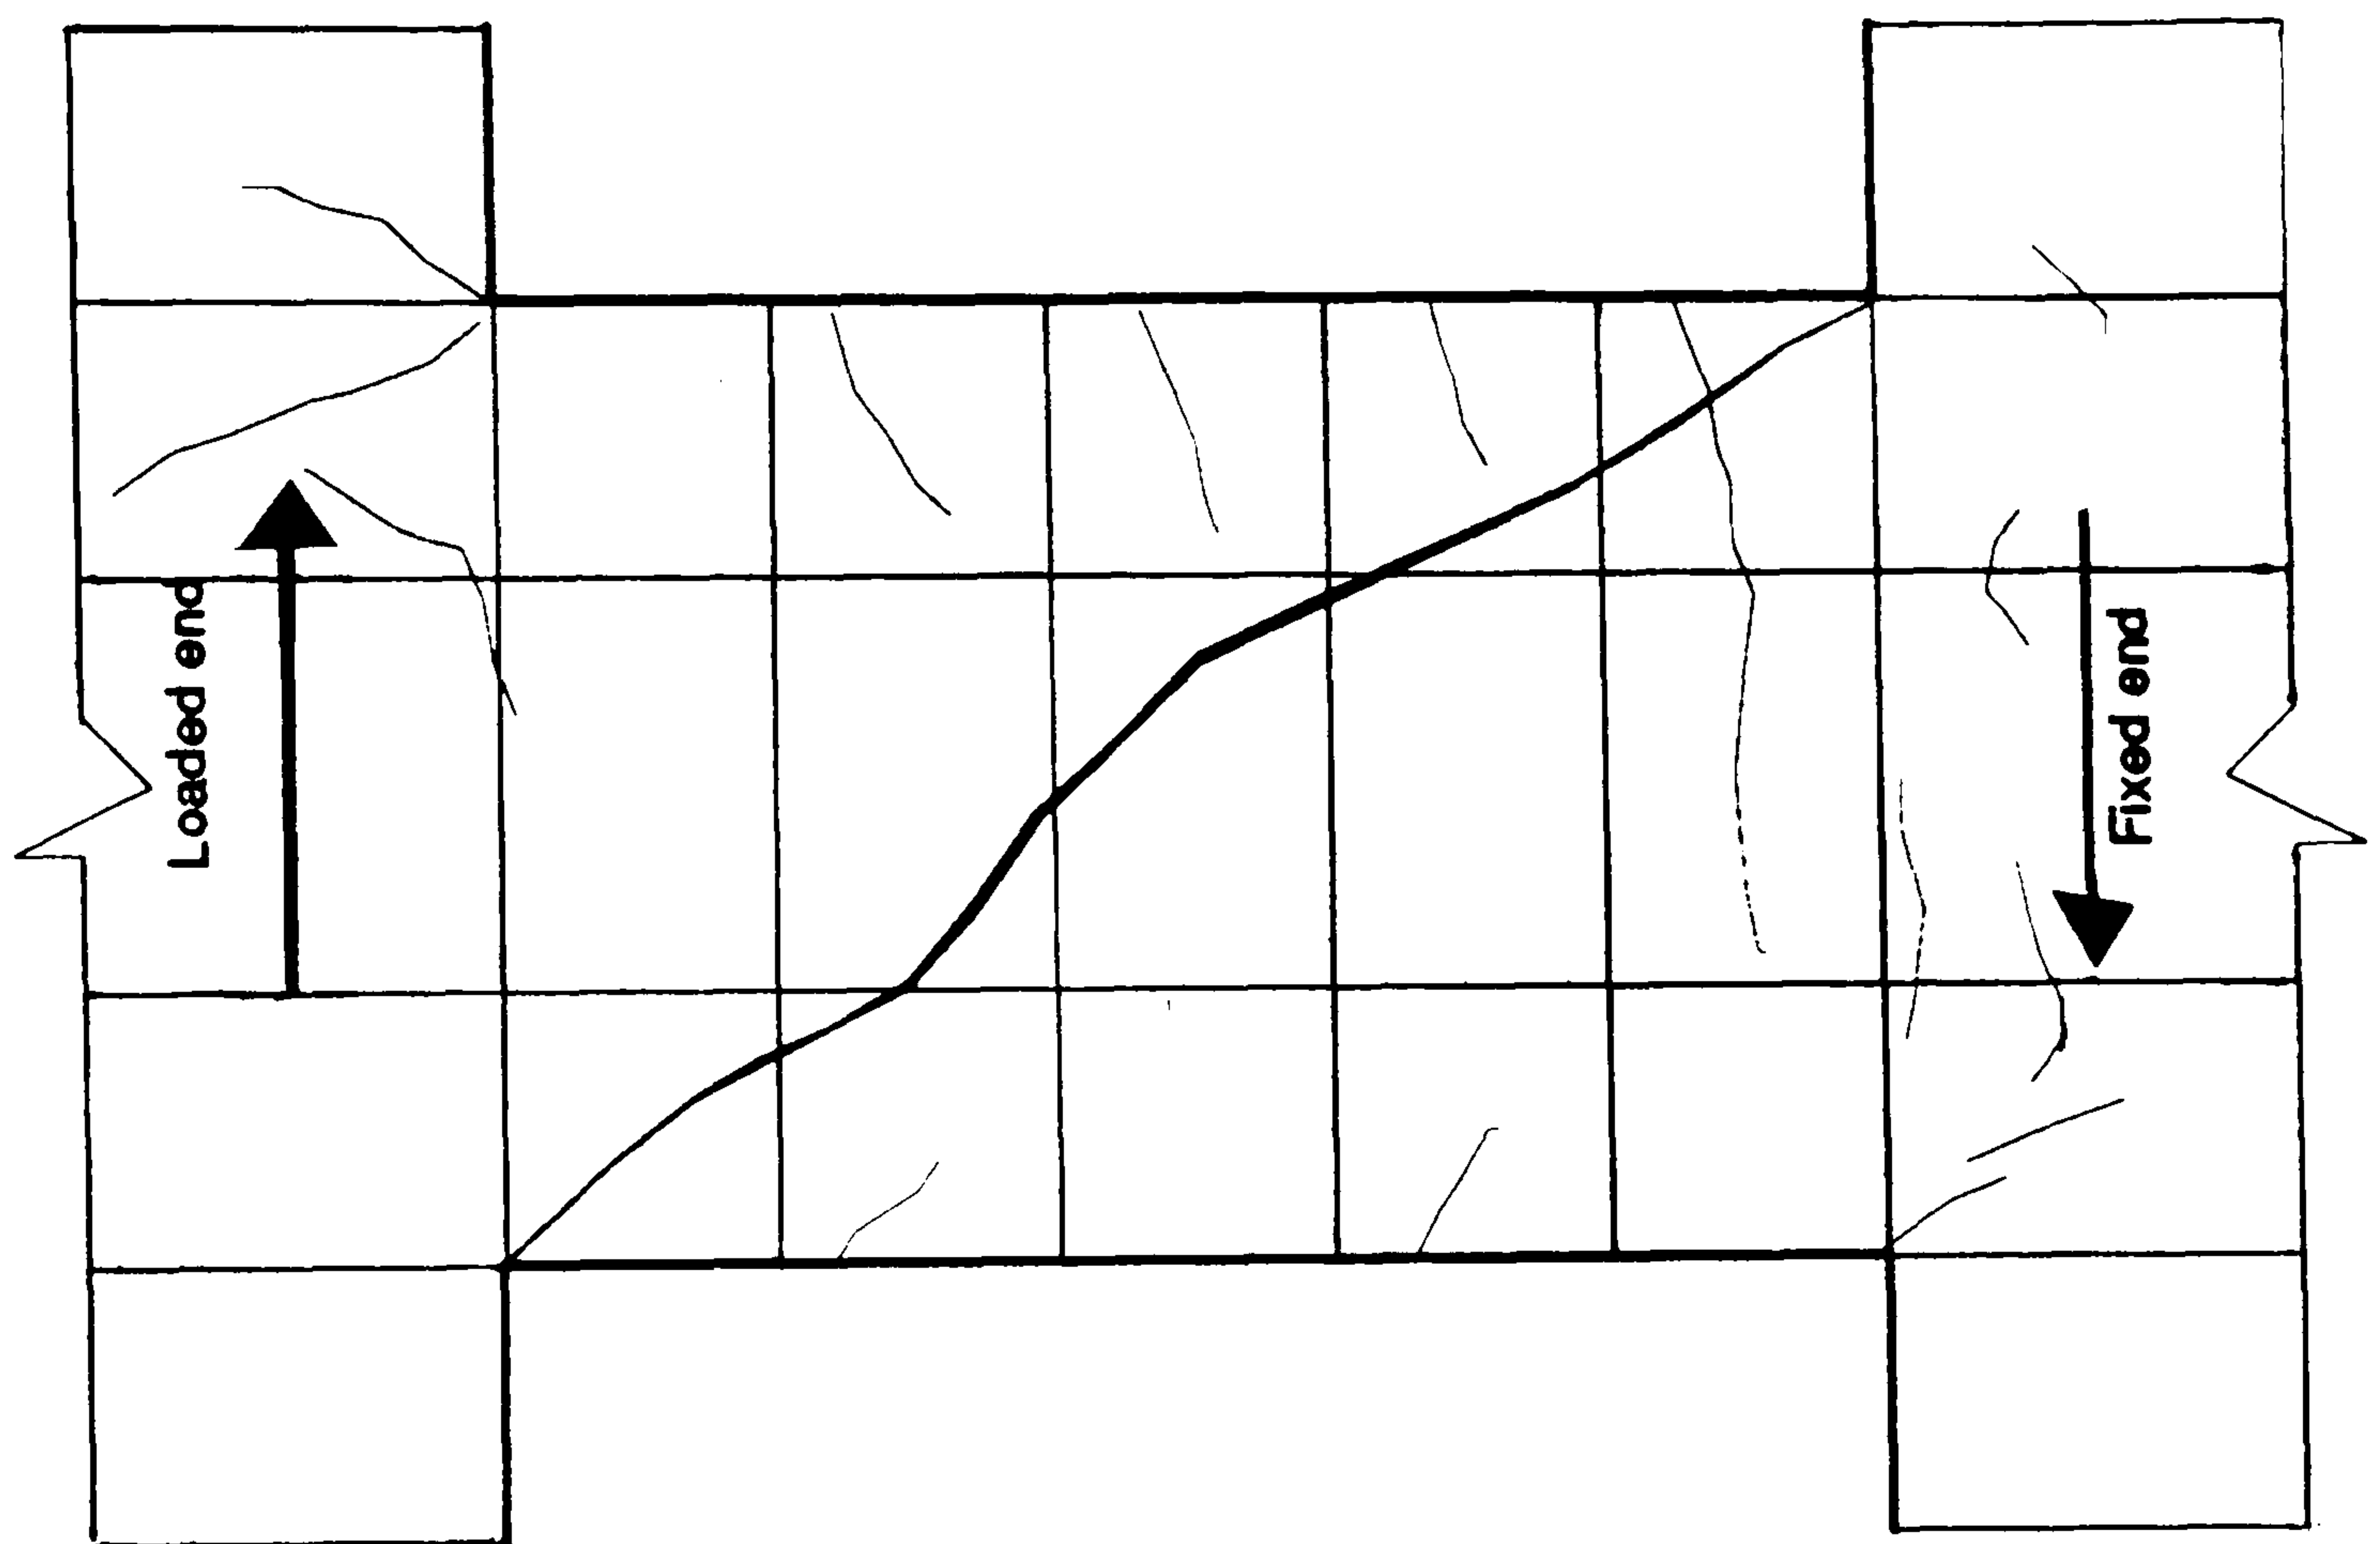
Failure mechanism and crack pattern for beam EBM1
